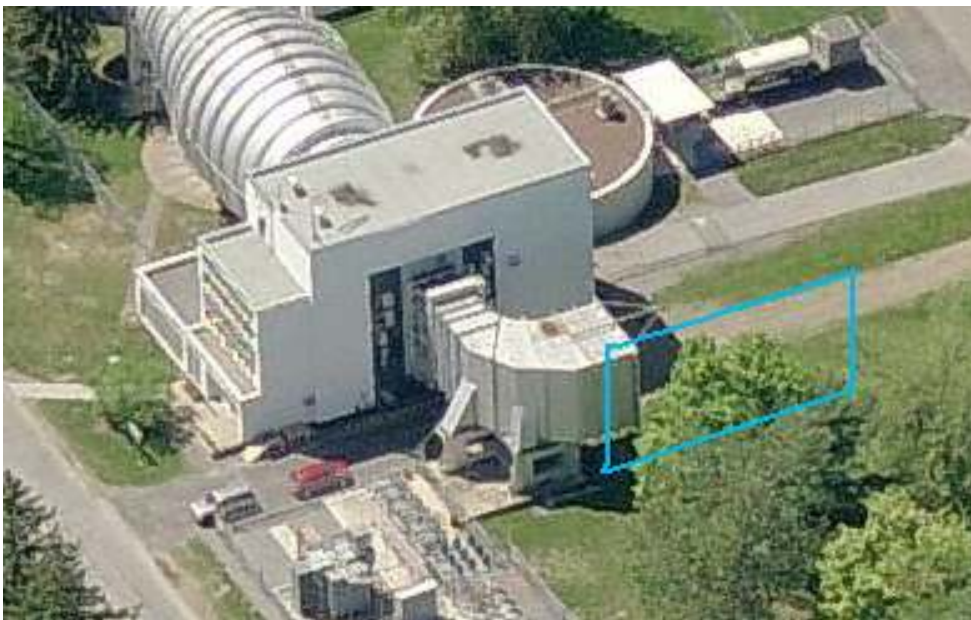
M46 Wind Tunnel Exhaust Barrier Wall – Concept View 4.
